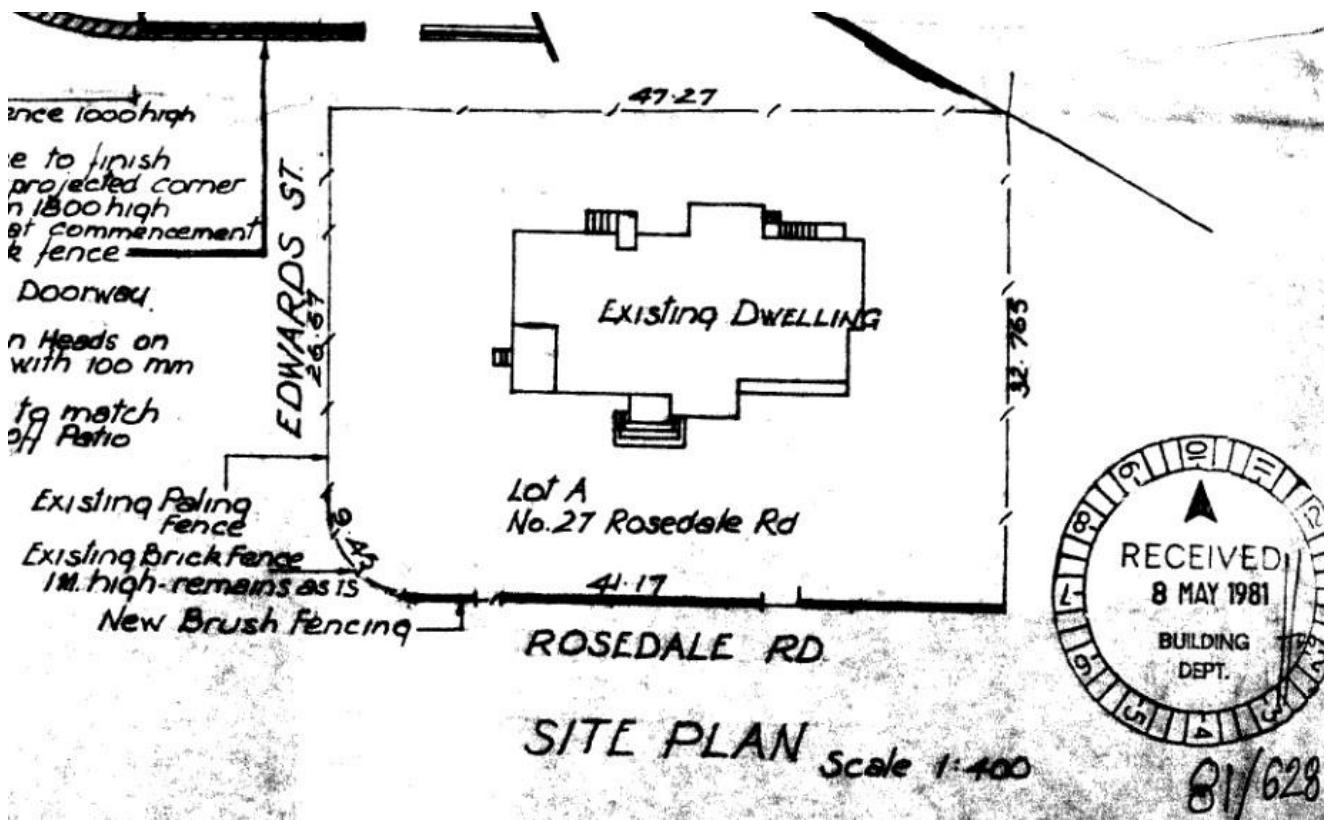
Extract of plans detailing new fence work dated to c. 1981.
